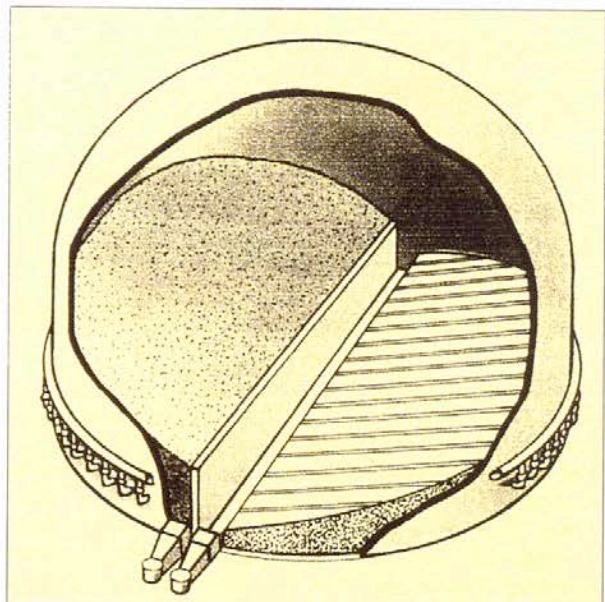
a dome with a fluidised floor and separation wall dividing the floor into two halves. This allows for full rotation of stock within just the one dome
